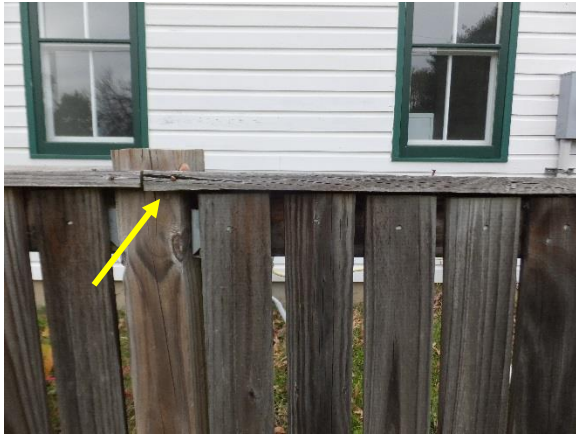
Multiple areas of splintered wood on fence at southeast facade.
